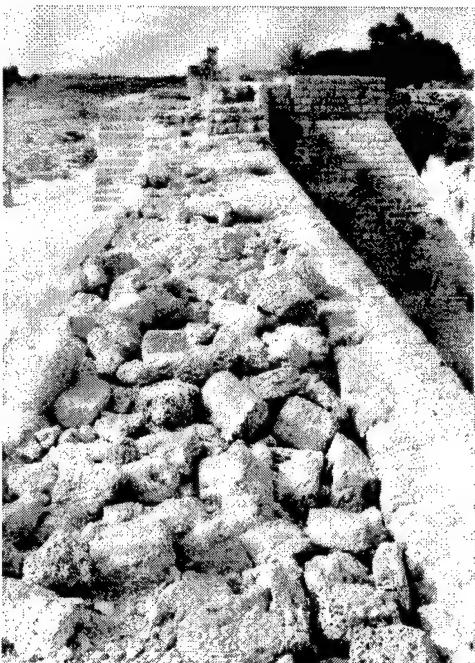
Curtain Wall Ashlar and Rubble Construction. (View north from southeast tower). Detail shows exterior and interior ashlar facing with rubble core.
